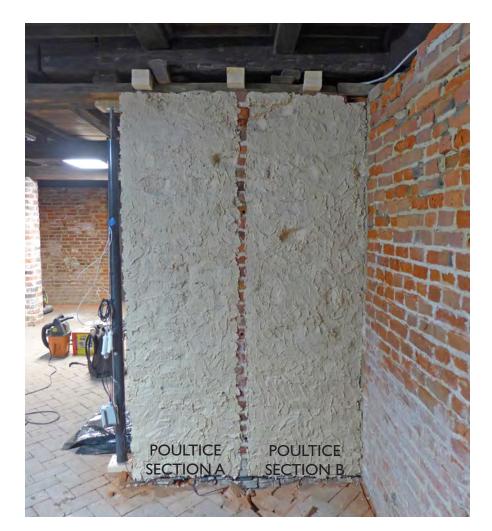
Poultice applied to poultice side of wall in two sections—Section A (left) and Section B (right).
